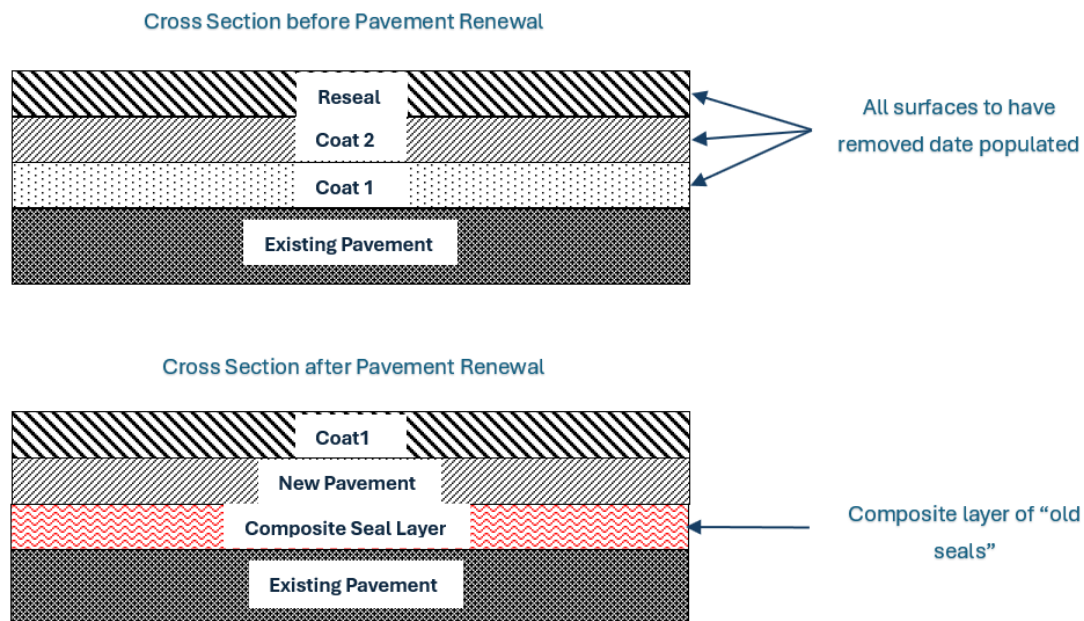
Cross-sections of pavement and top surface before and after pavement renewal
